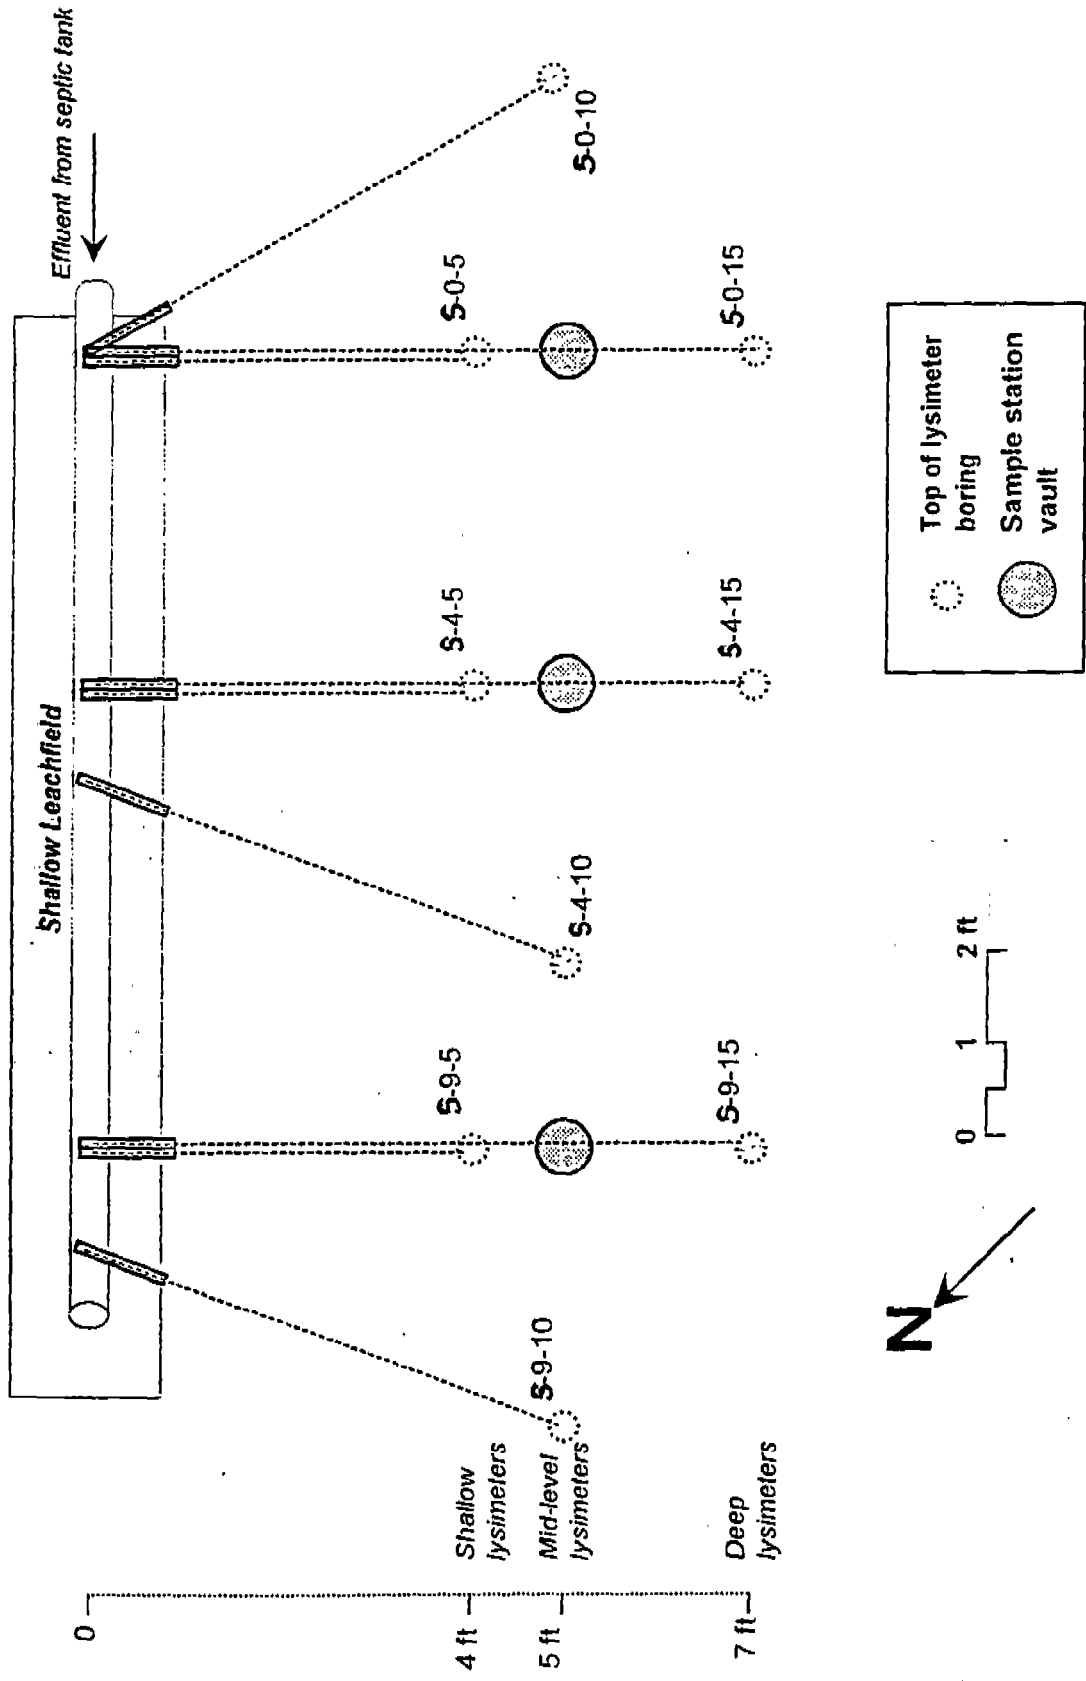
Plan view of lysimeter array at the shallow leachfield,
